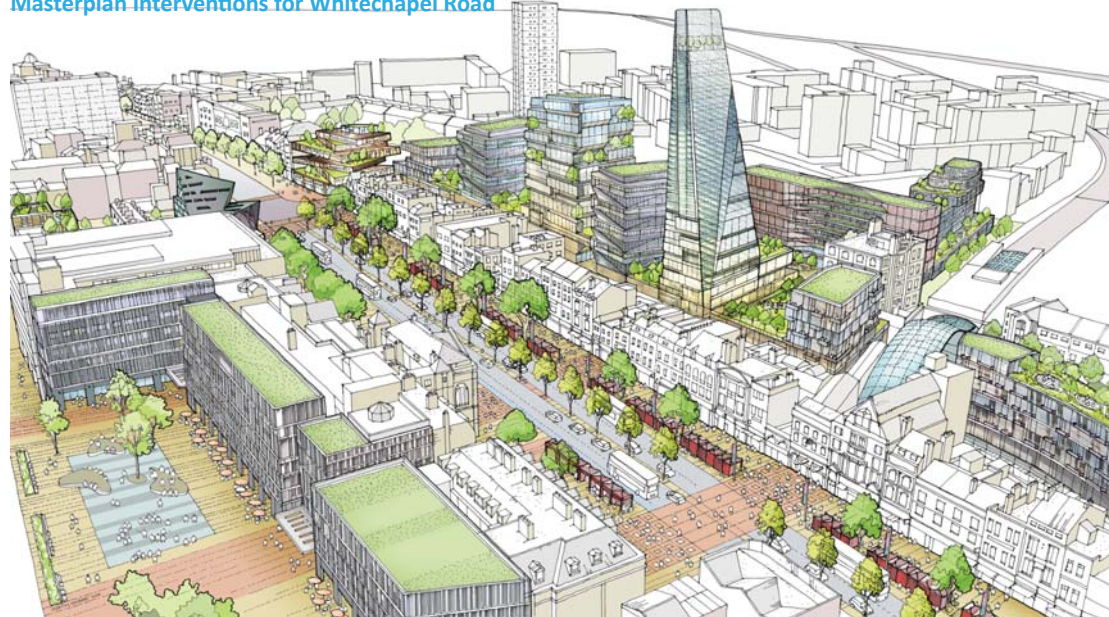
Birdseye view looking northwest ward across Whitechapel Road
